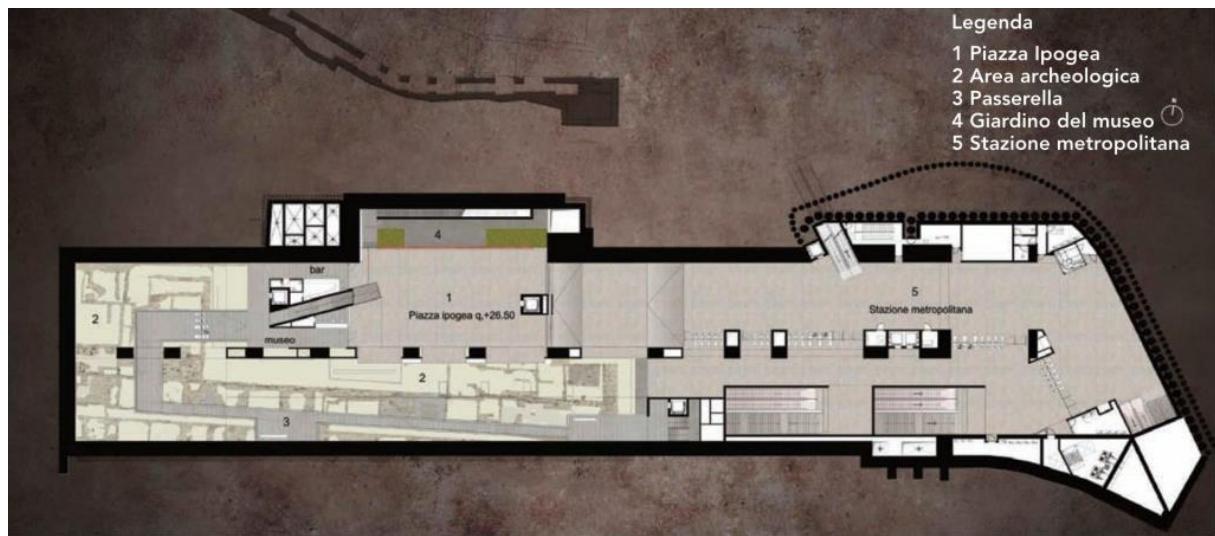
Floor plan of Amba Aradam metro station ticketing level, showing the spatial division between the station to the museum area. Source: Mobilita.org, “ROMA METRO C | Ecco come sarà la Stazione Amba Aradam.”
